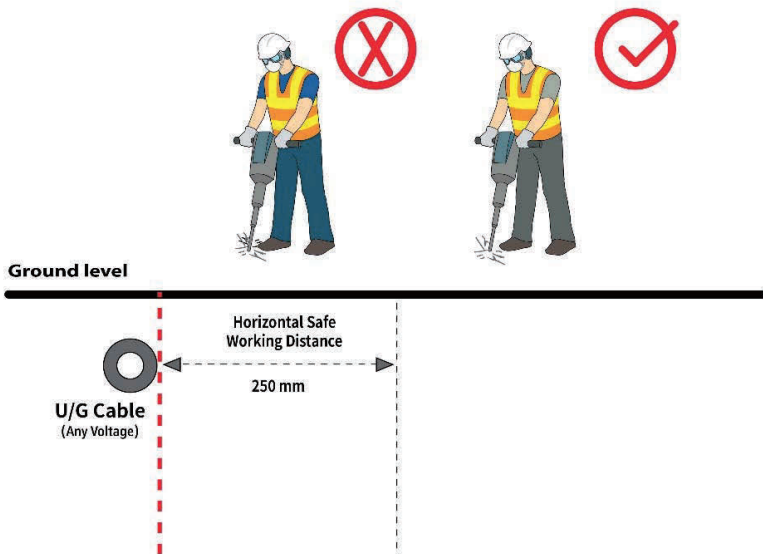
Horizontal safe working distance when breaking out paved concrete surface
